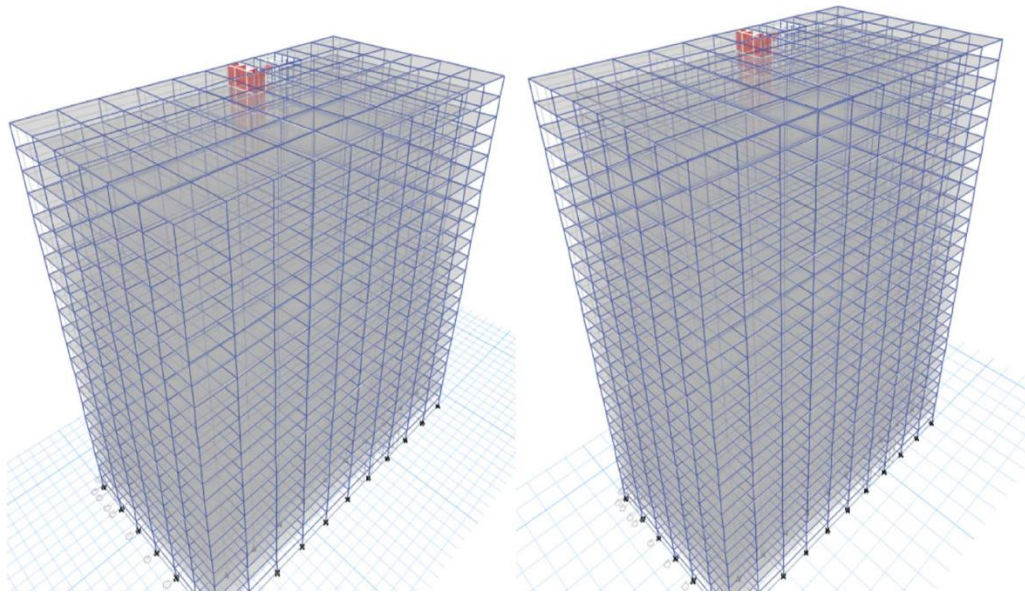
ETABS 3D model without expansion joint: (a) 20-storey building; (b) 25-storey building.
